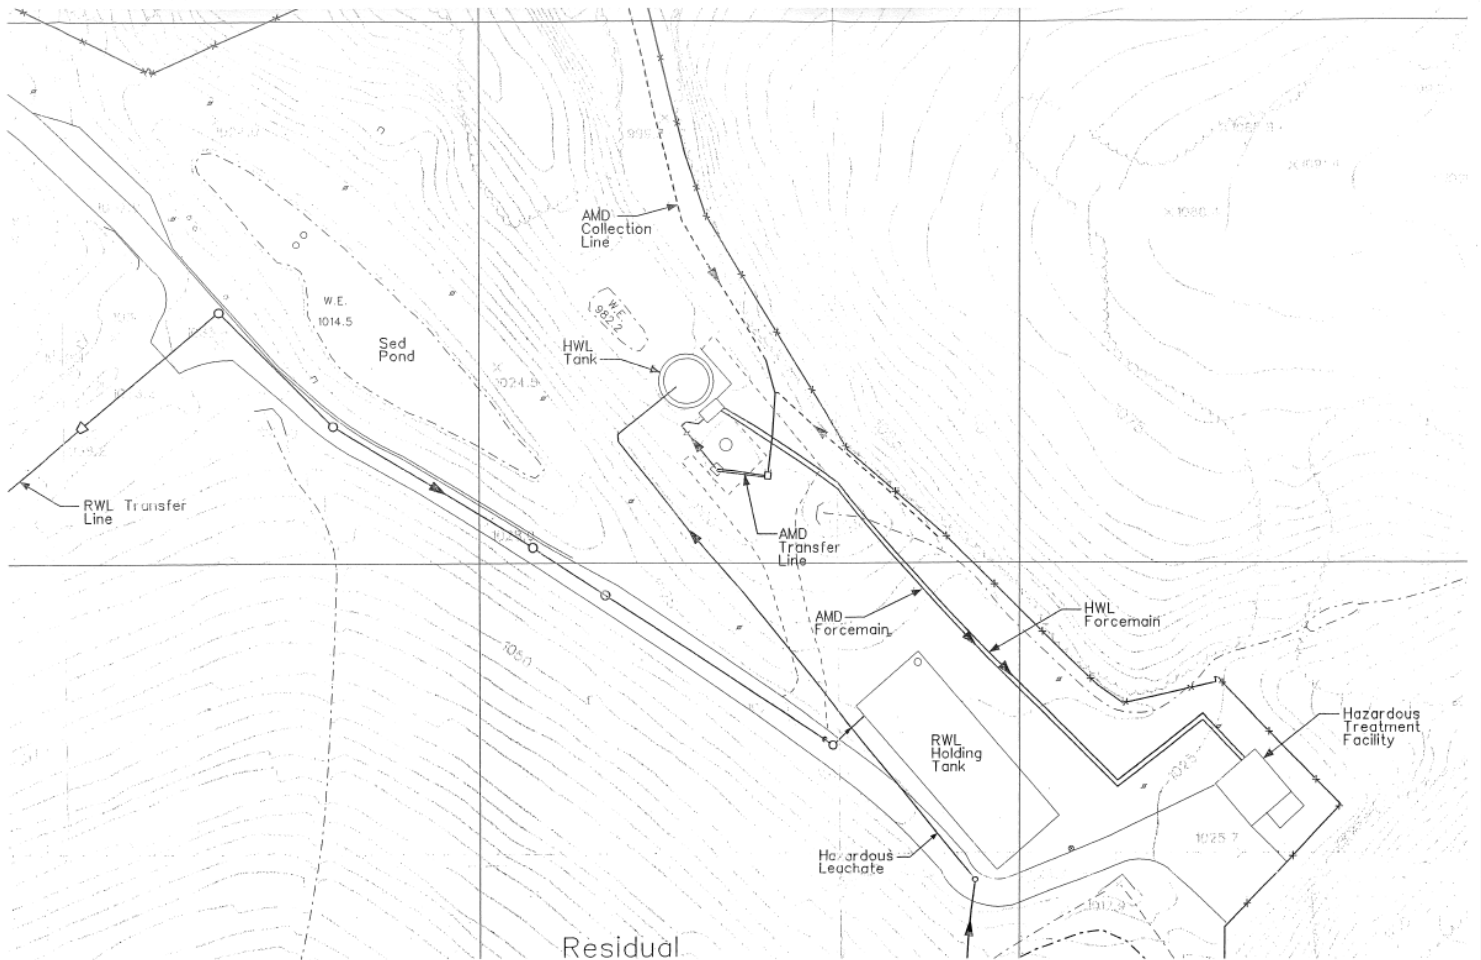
USS STEP Site with Stormwater Outfalls and Associated Drainage Areas
